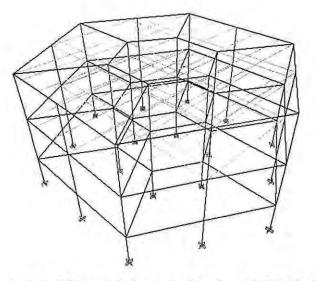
3D view of the FE model of a typical cyclone shelter built by Grameen Bank (without bracing)
